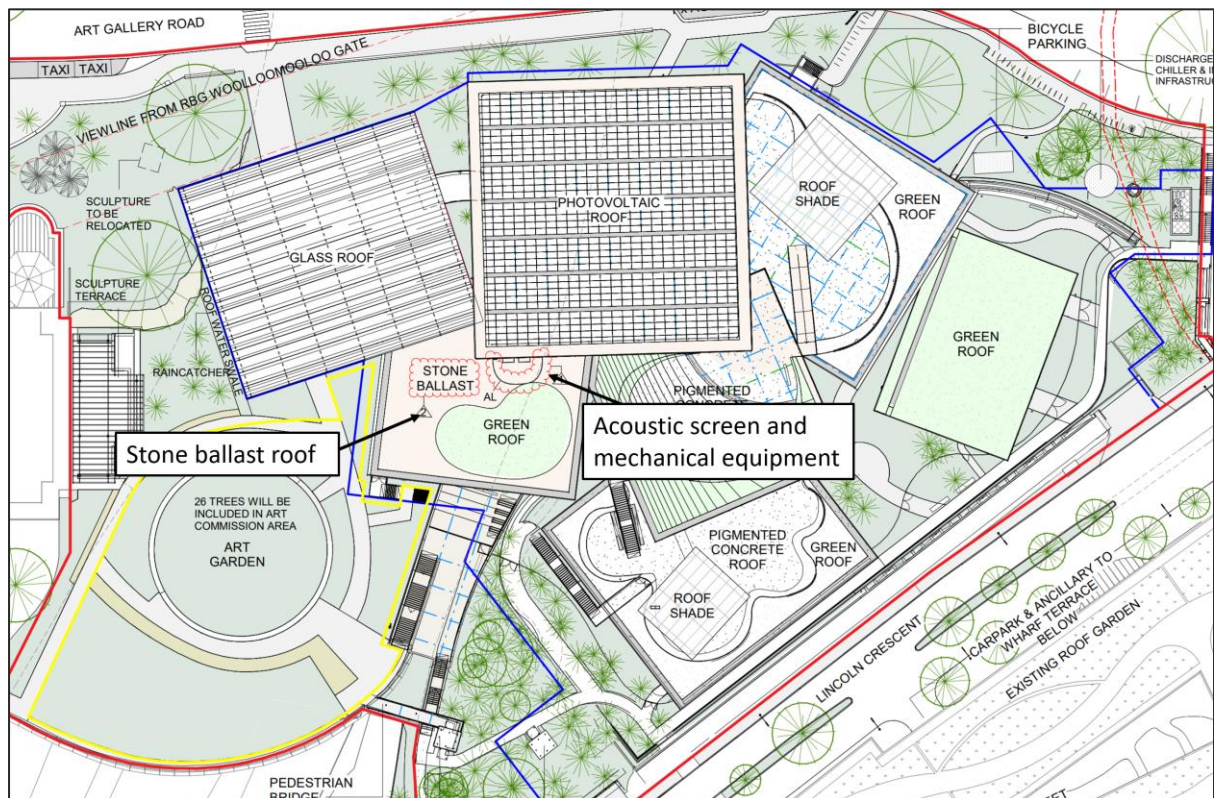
| Roof Plan – proposed changes outlined in red (Base source: Applicant)
